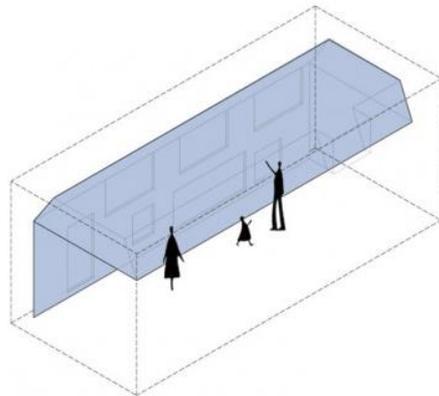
Show case and activity space at the entrance of Ruikangli on East Beijing Road
